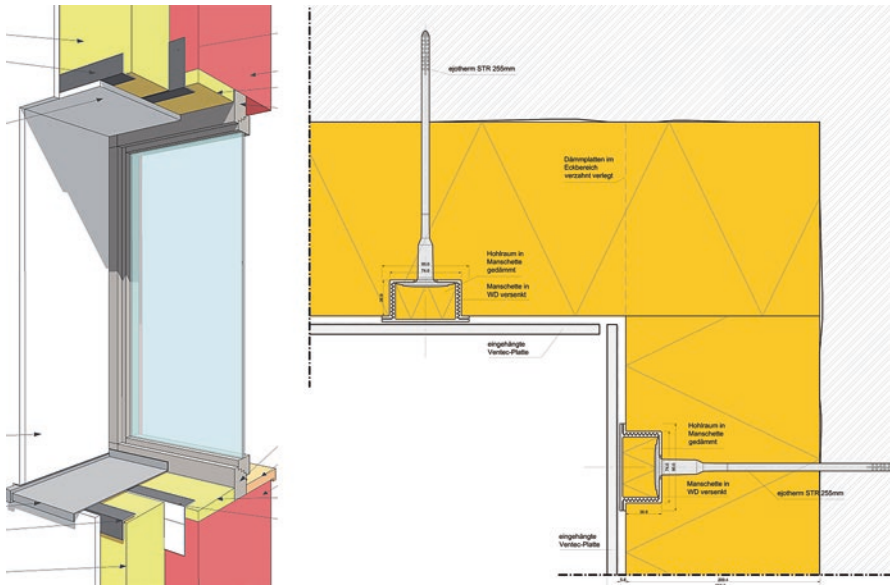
Fastener-fixation-corner-angle for corner detail fixation [3]
